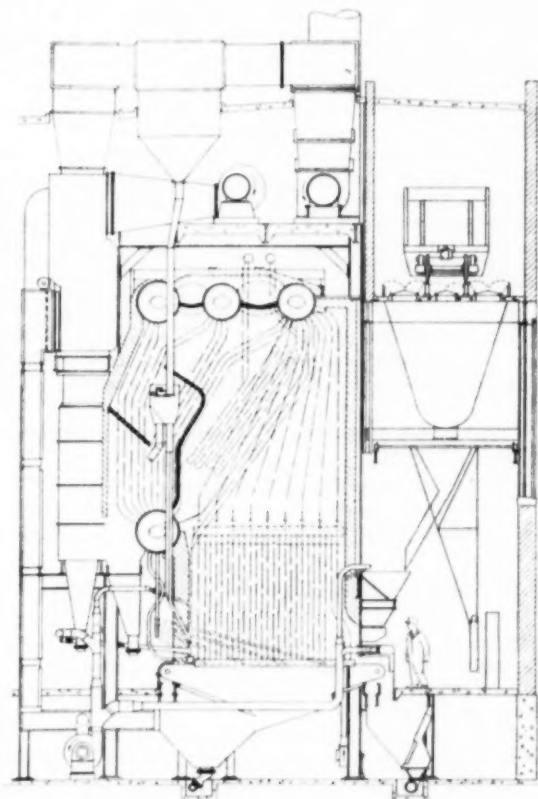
SIDE ELEVATION OF BOILER TEST PLANT
